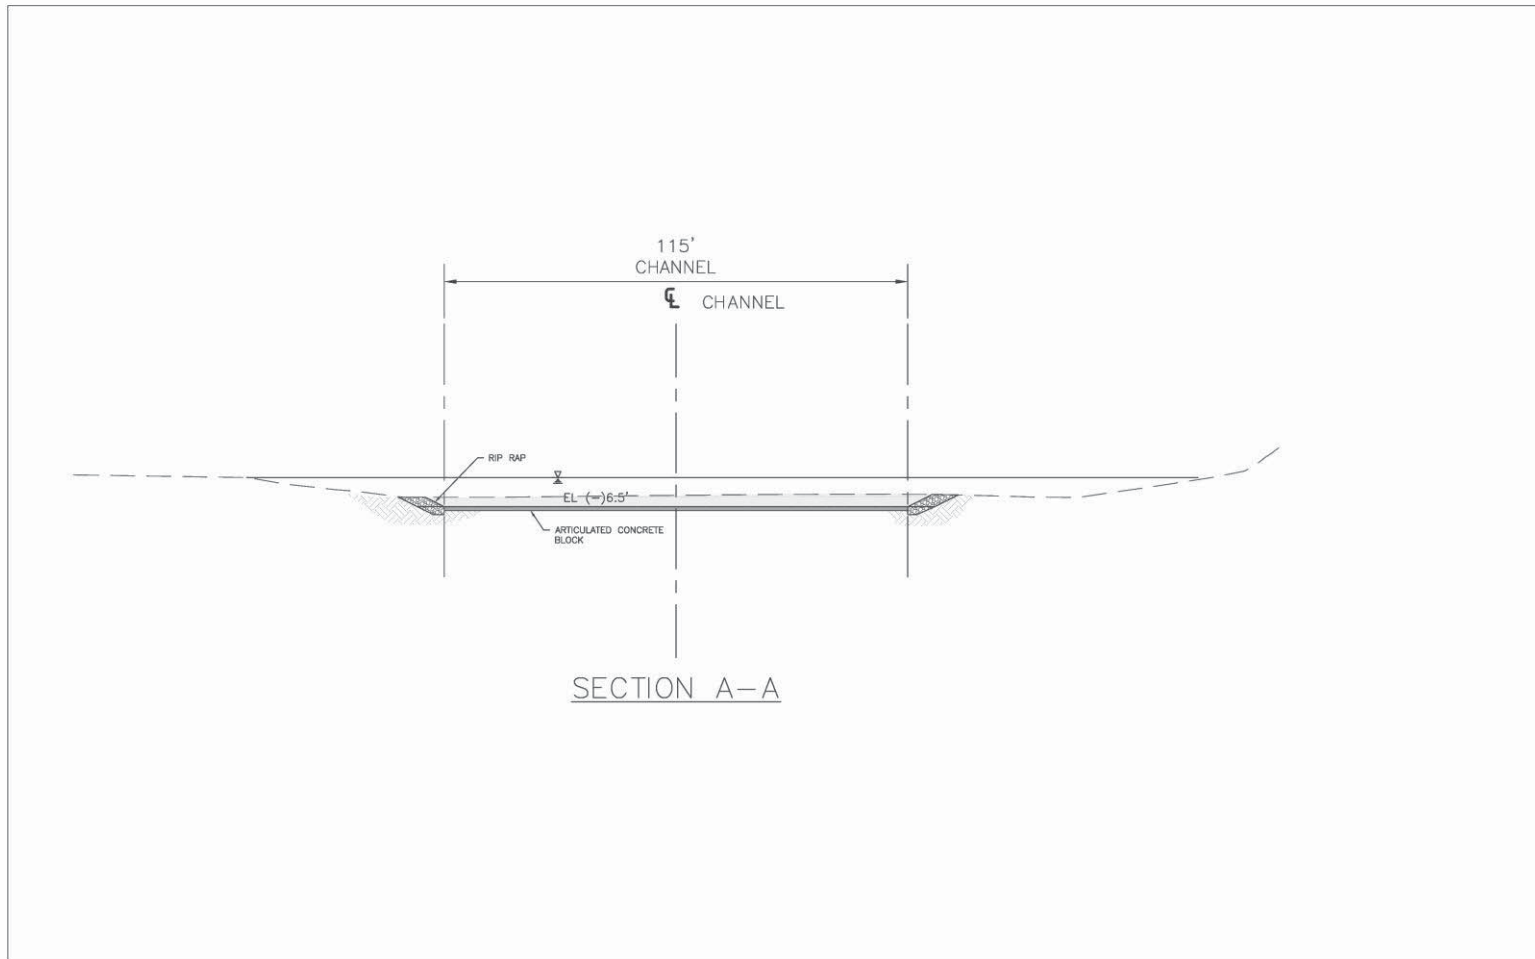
Cross Section A-A, Luis Muñoz Rivera Avenue Bridge
